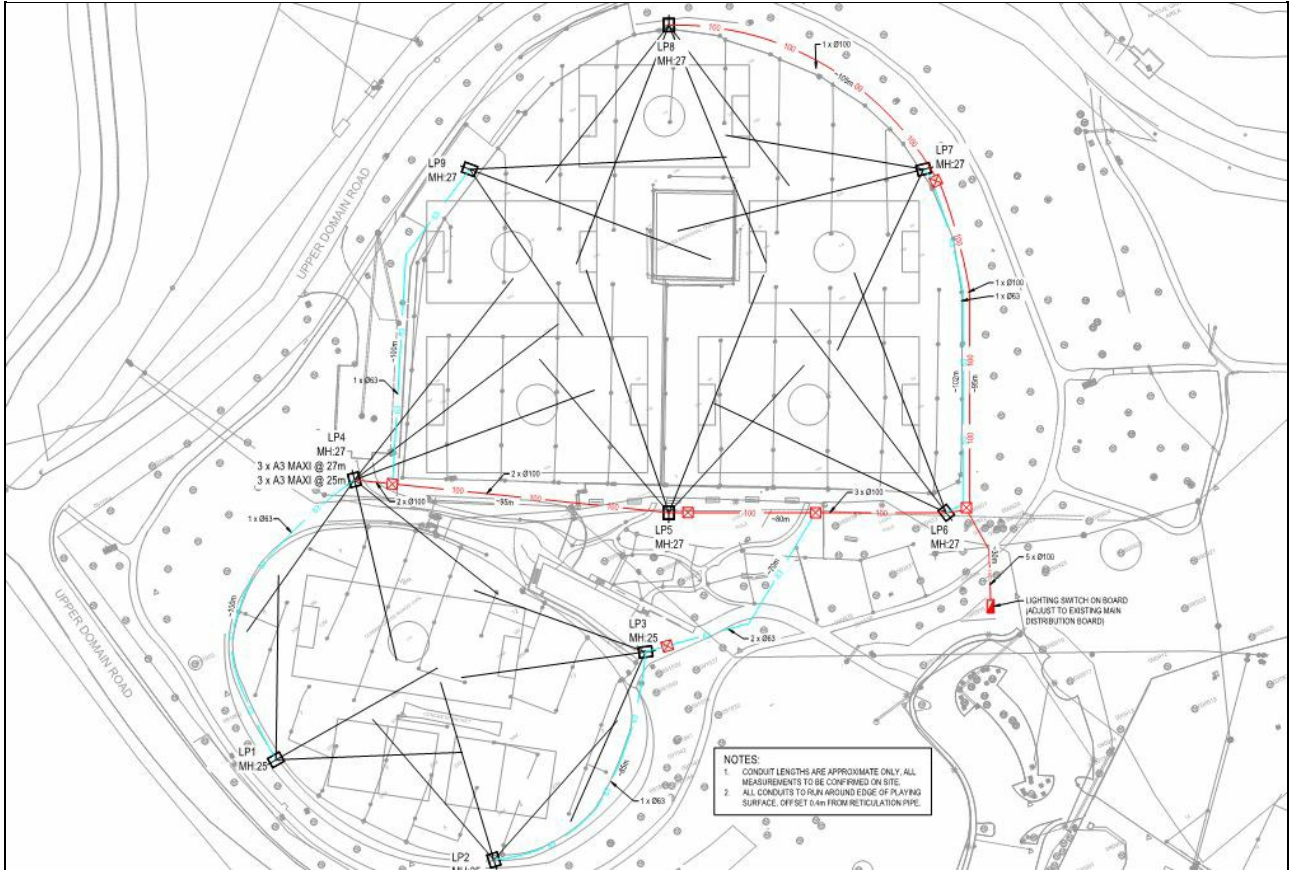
Plan showing the proposed new light towers. Source: Pitt and Sherry Report to Support a Development Application.
